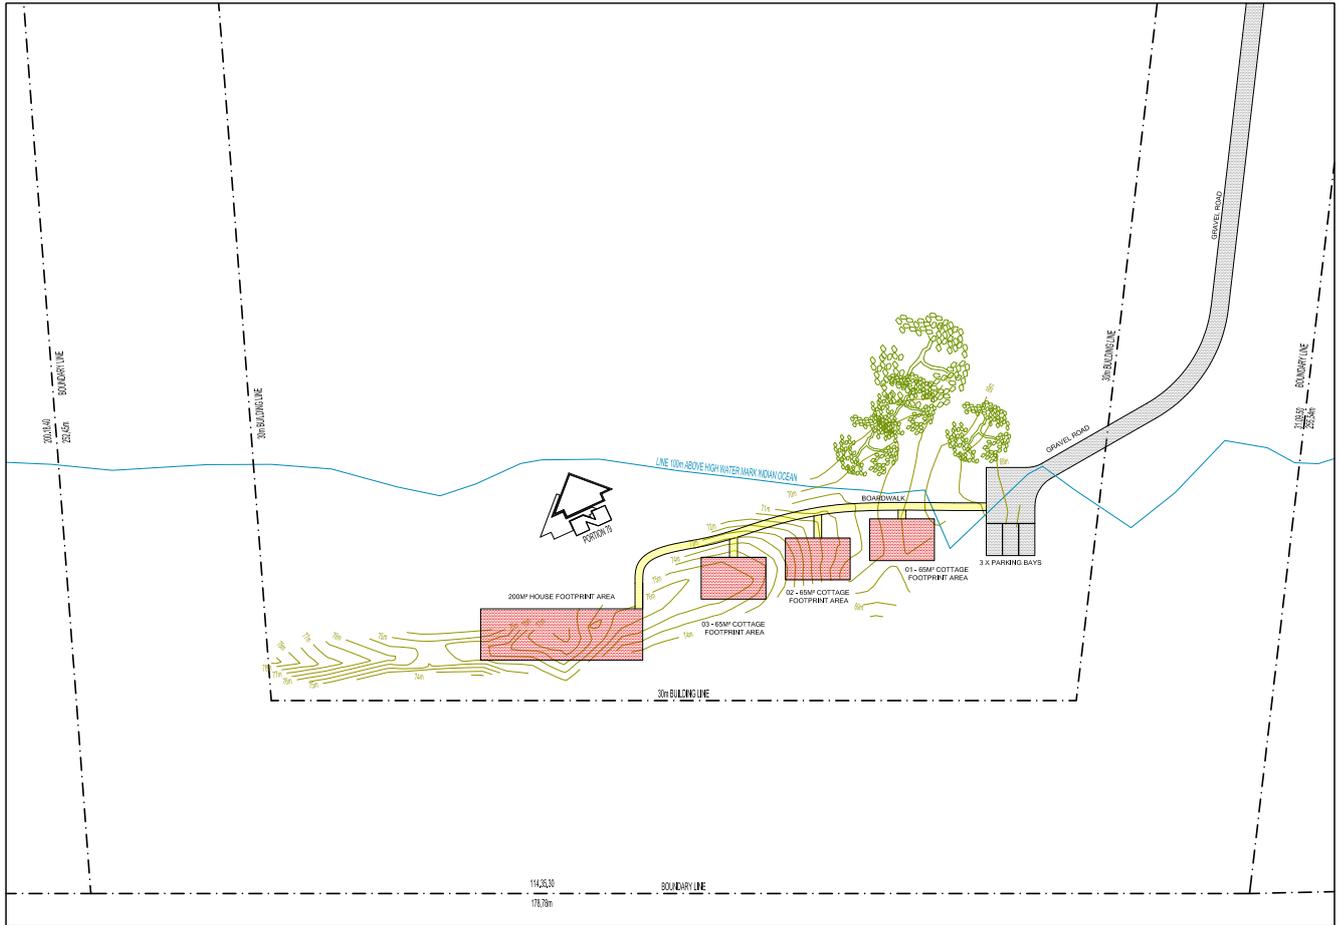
Architectural Concept Ideas for the Proposed Building Designs
